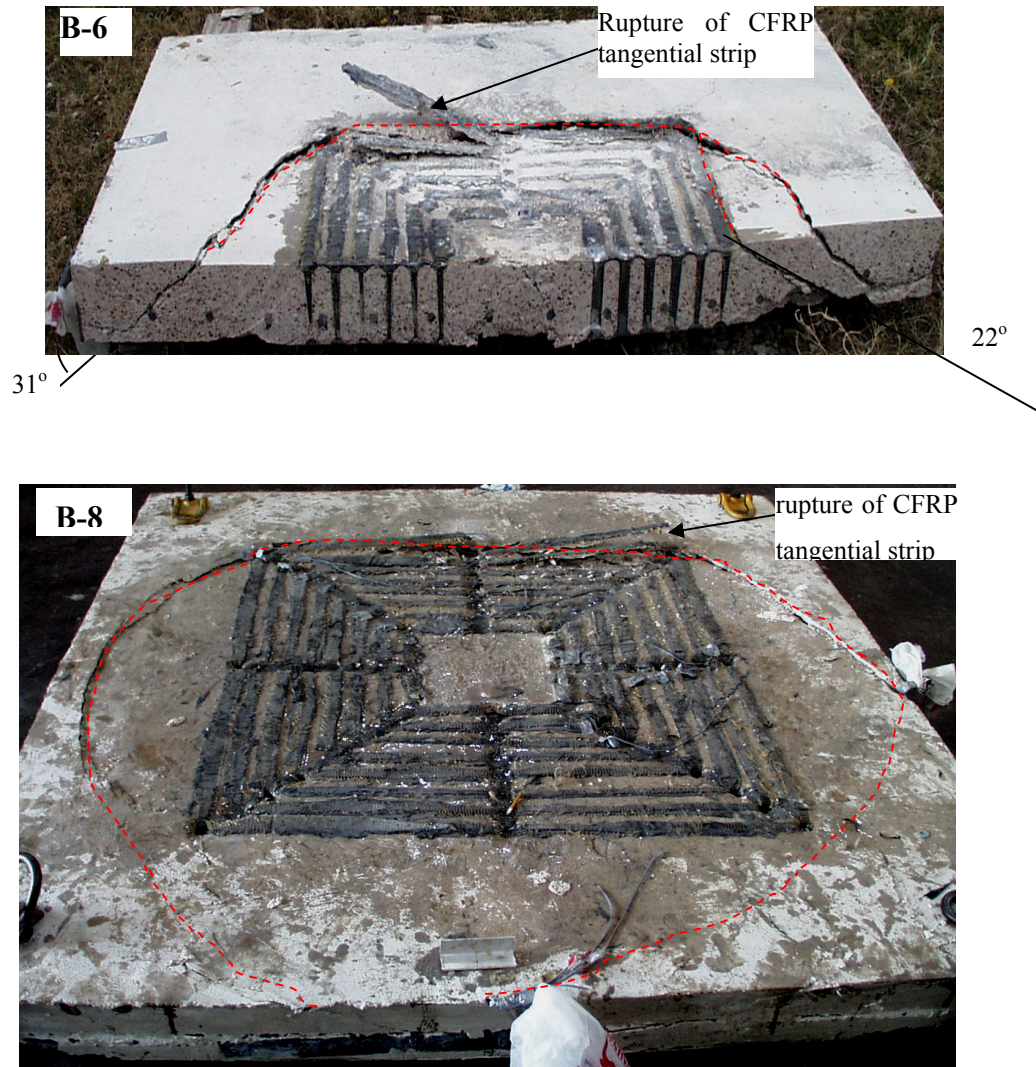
Failed Surfaces and Inclined Cracks for B-6 and B-8
